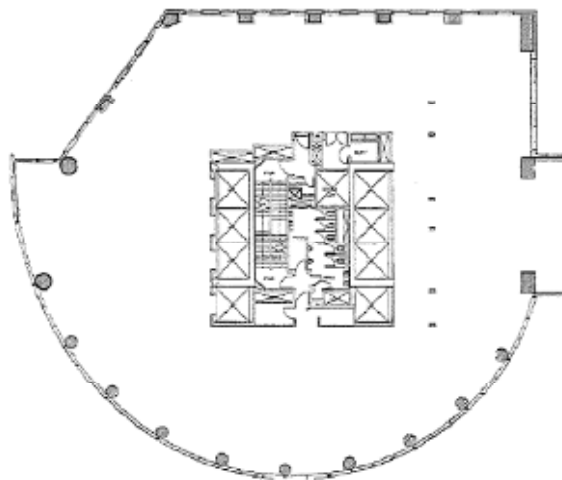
Majestic Floor Plan (MacLennan, 2011)
